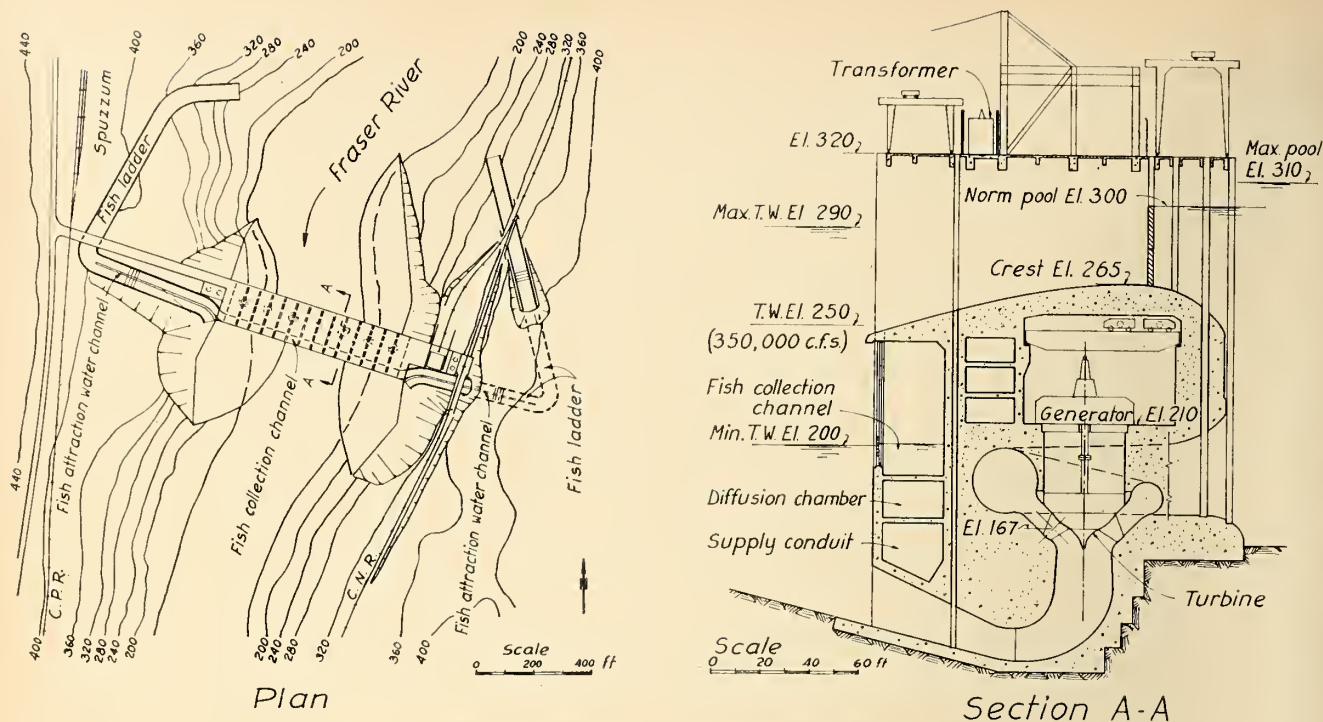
Plan and cross section of the proposed Spuzzum Dam.
